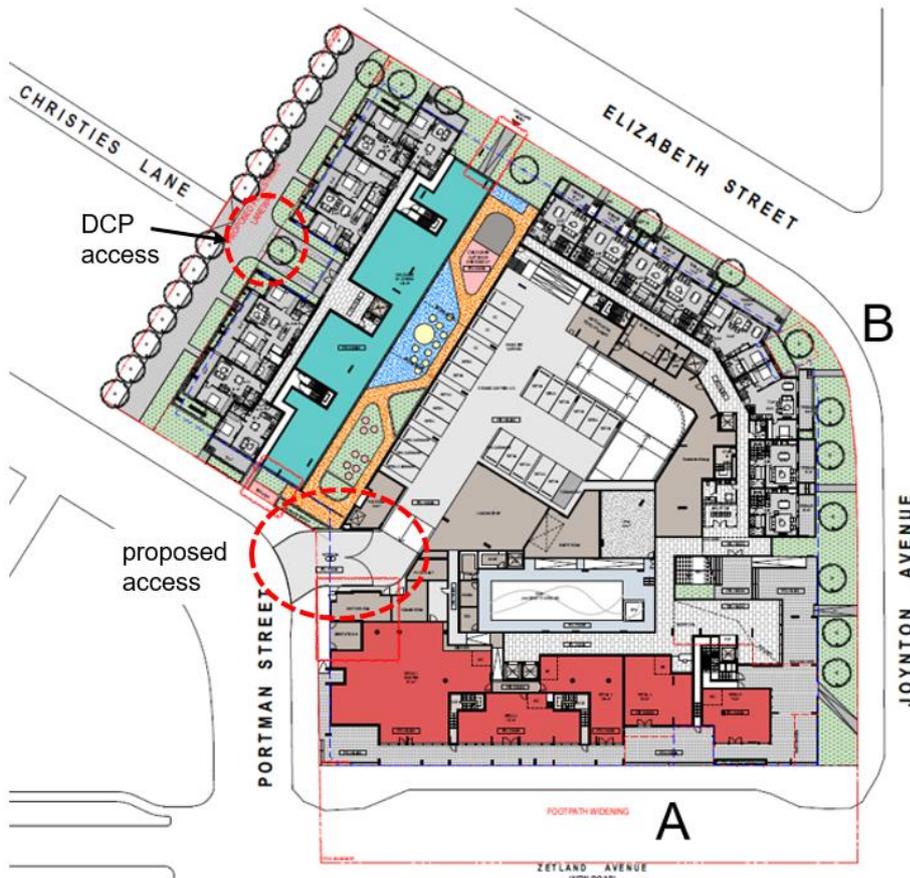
Proposed Ground Floor plan depicting proposed vehicular access on Portman Street, and location of DCP recommended access within shared zone.
